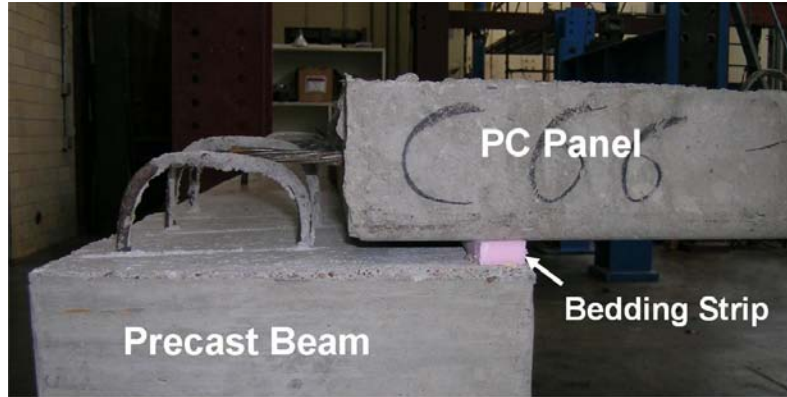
Test Specimen Bedding Strip with PCP in Place
